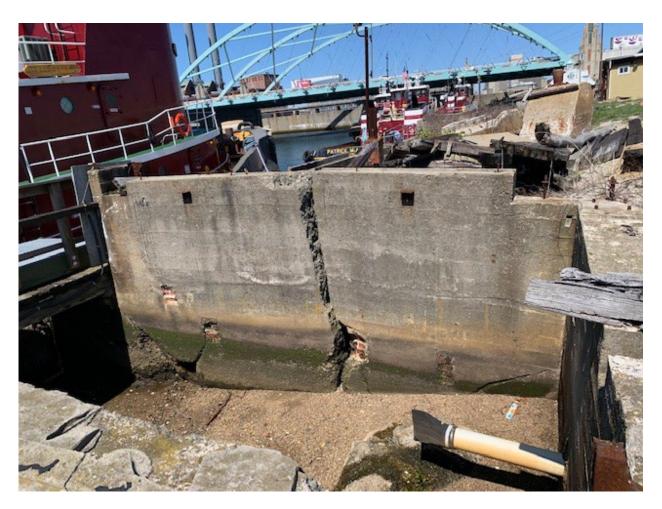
Failed north wall of the south concrete pen and 8" dia. stormwater outfall with duckbill valve. The intent would be to extend this outfall pipe through the steel sheetpile bulkhead. The mean high tide line was determined at this site from the black staining on the concrete walls. The soil above the concrete floor at the western end of the pen is believed to be the result of erosion of the upland soil through the large cracks in the pen walls.
